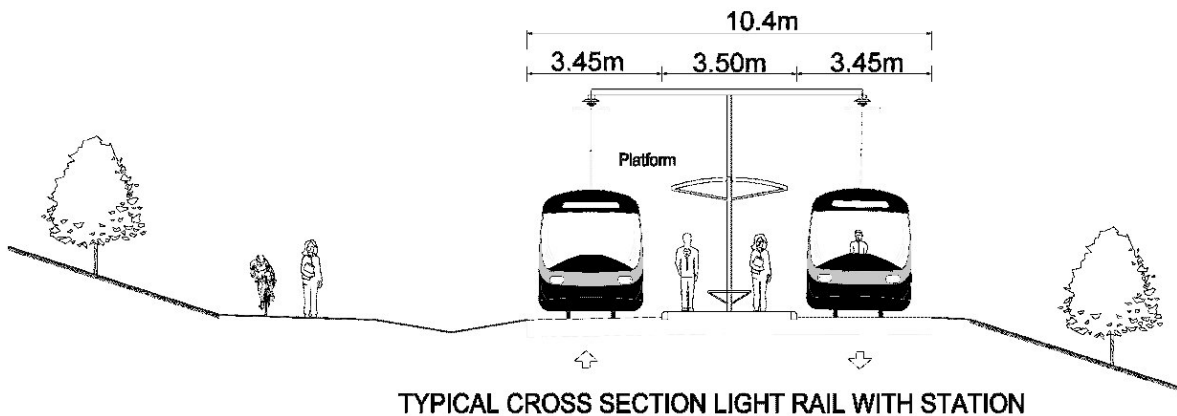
Cross-section of Light Rail Station with Island Platform
